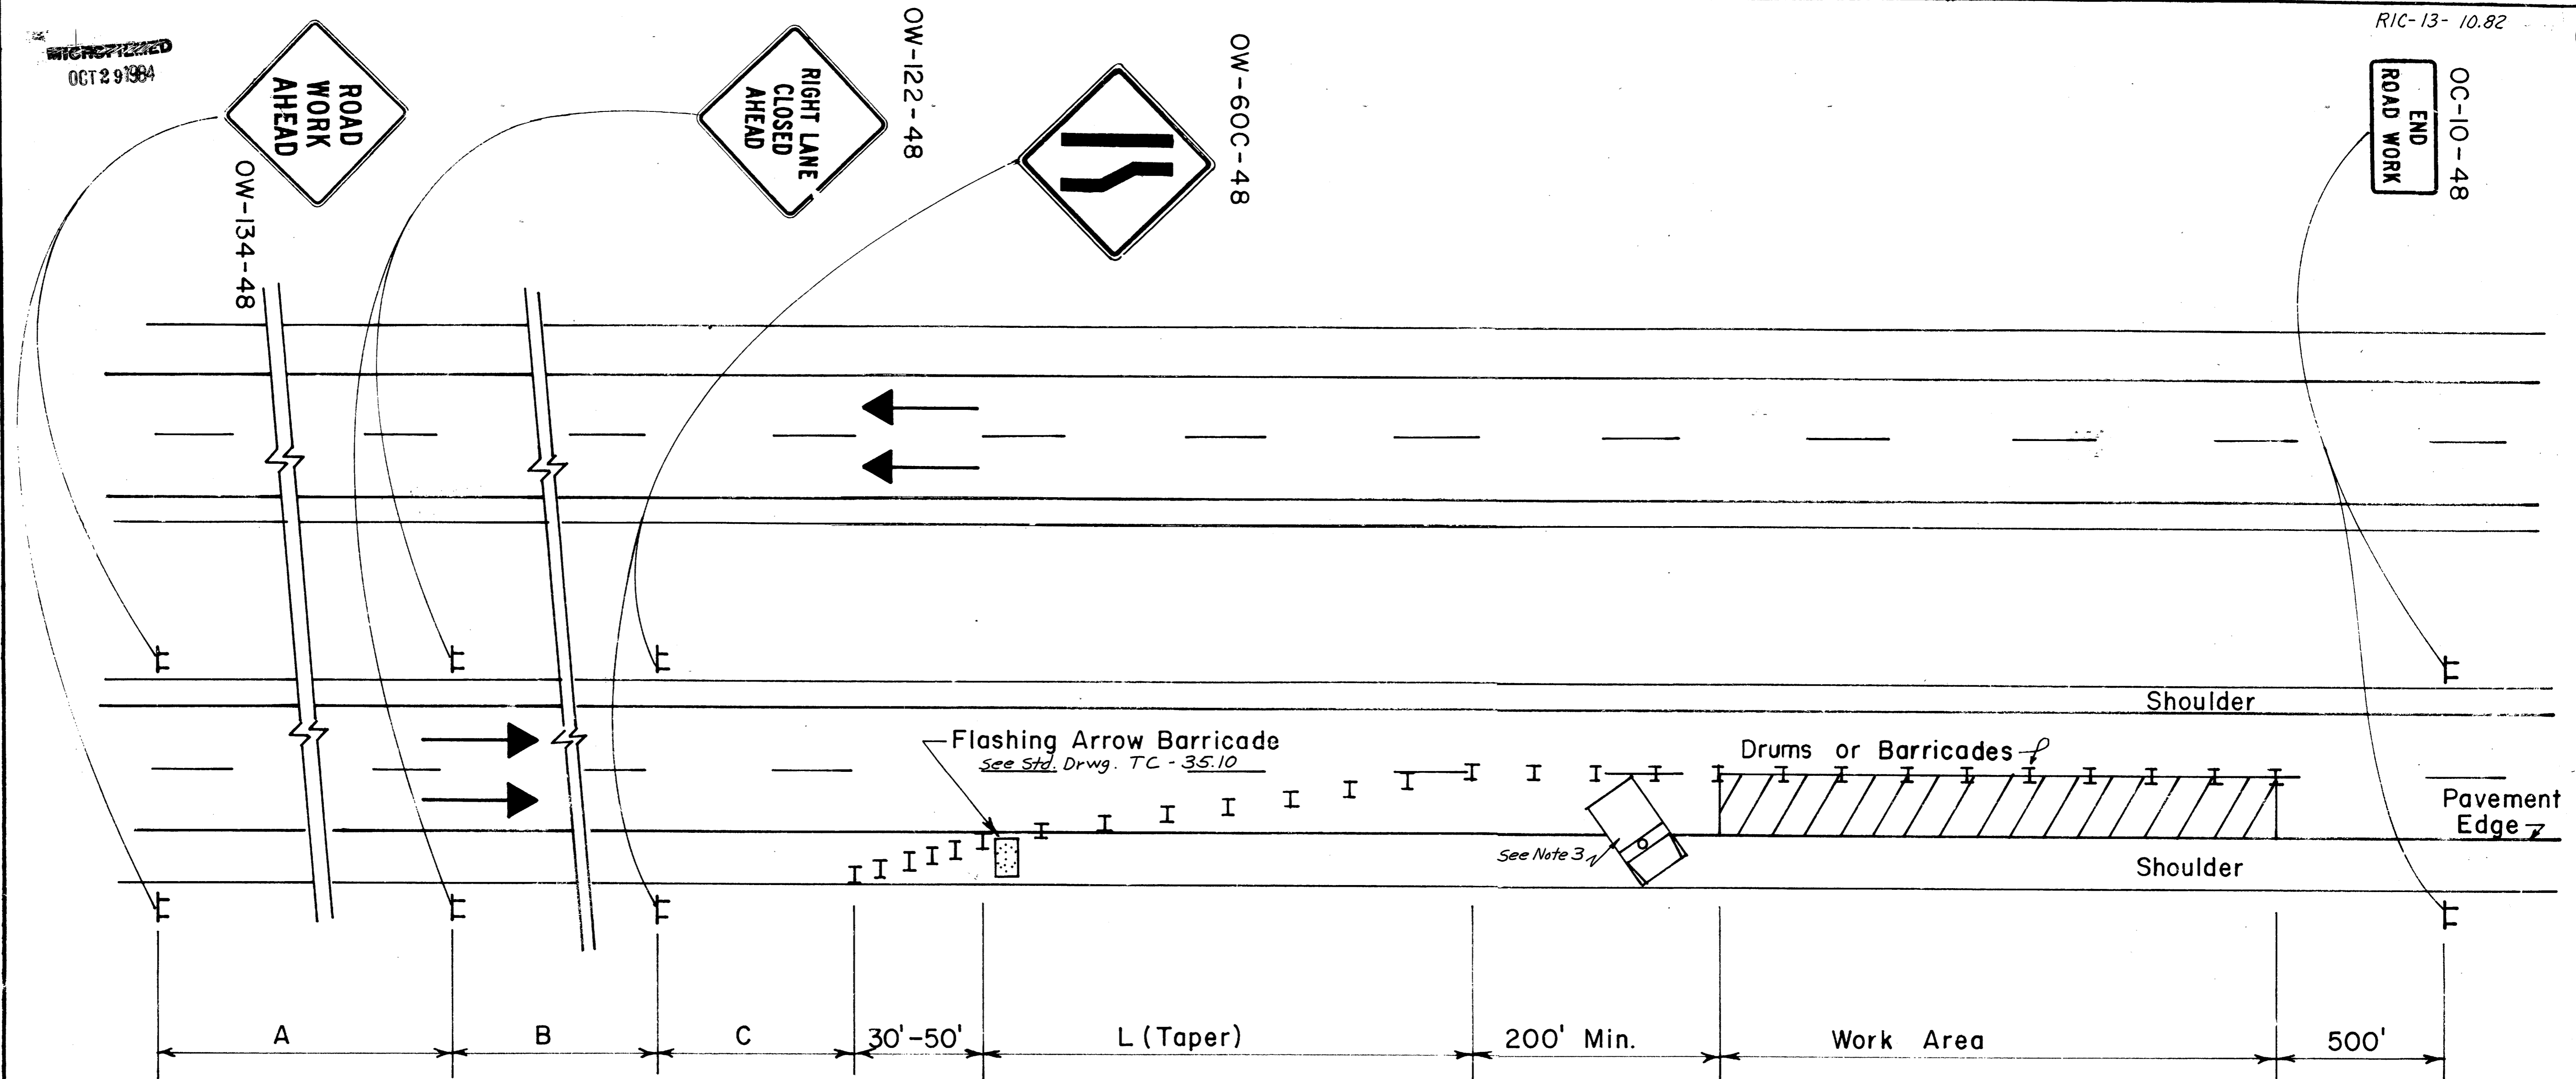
DETAIL FOR LANE CLOSURE FOR PAVEMENT REPAIR
